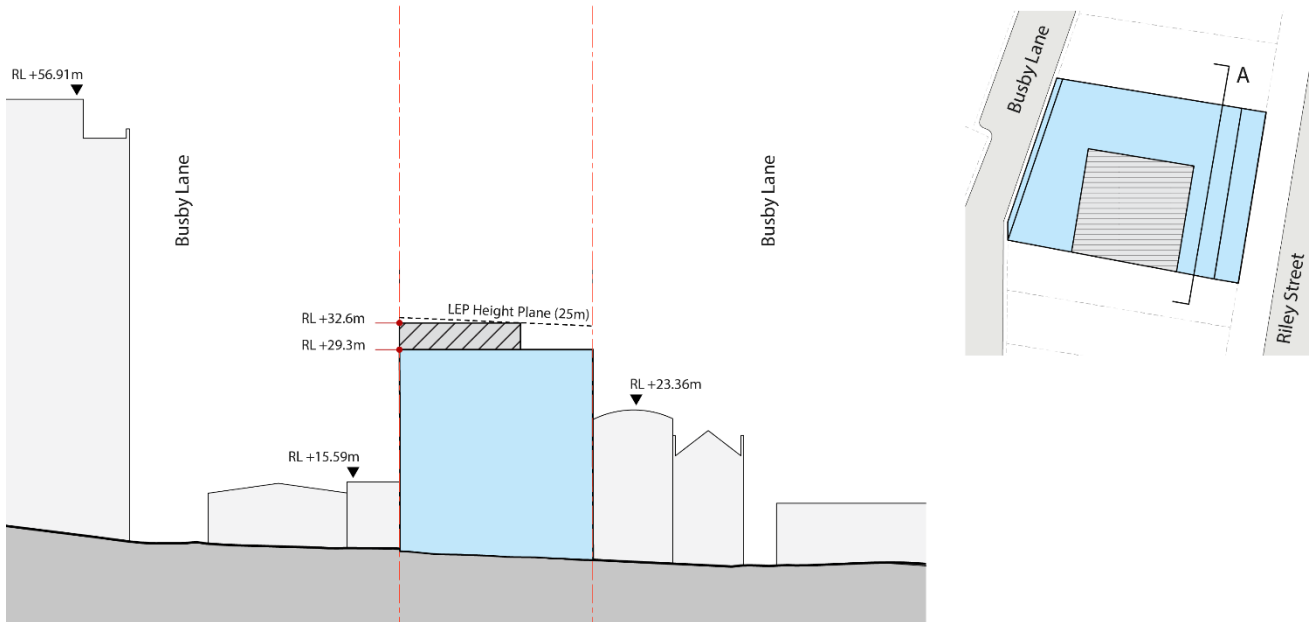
X 47-51 Riley Street, Woolloomooloo – Maximum Building Envelope Section A (hatched area represents an allowance for roof top structures under the LEP Height control)
